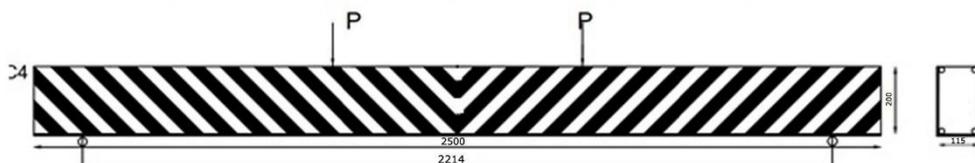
Wrapping of beam at 45° with 50 mm spacing – C4
